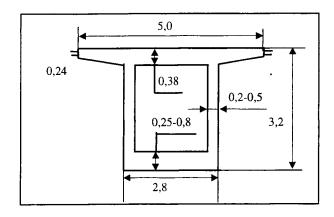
Cross-section of box-girder (Šilo St. bridge - Fig 1, c)
